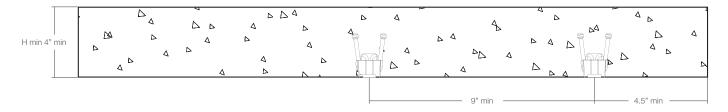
shows Spider Wood Form Insert in 4 inch concrete slab.
